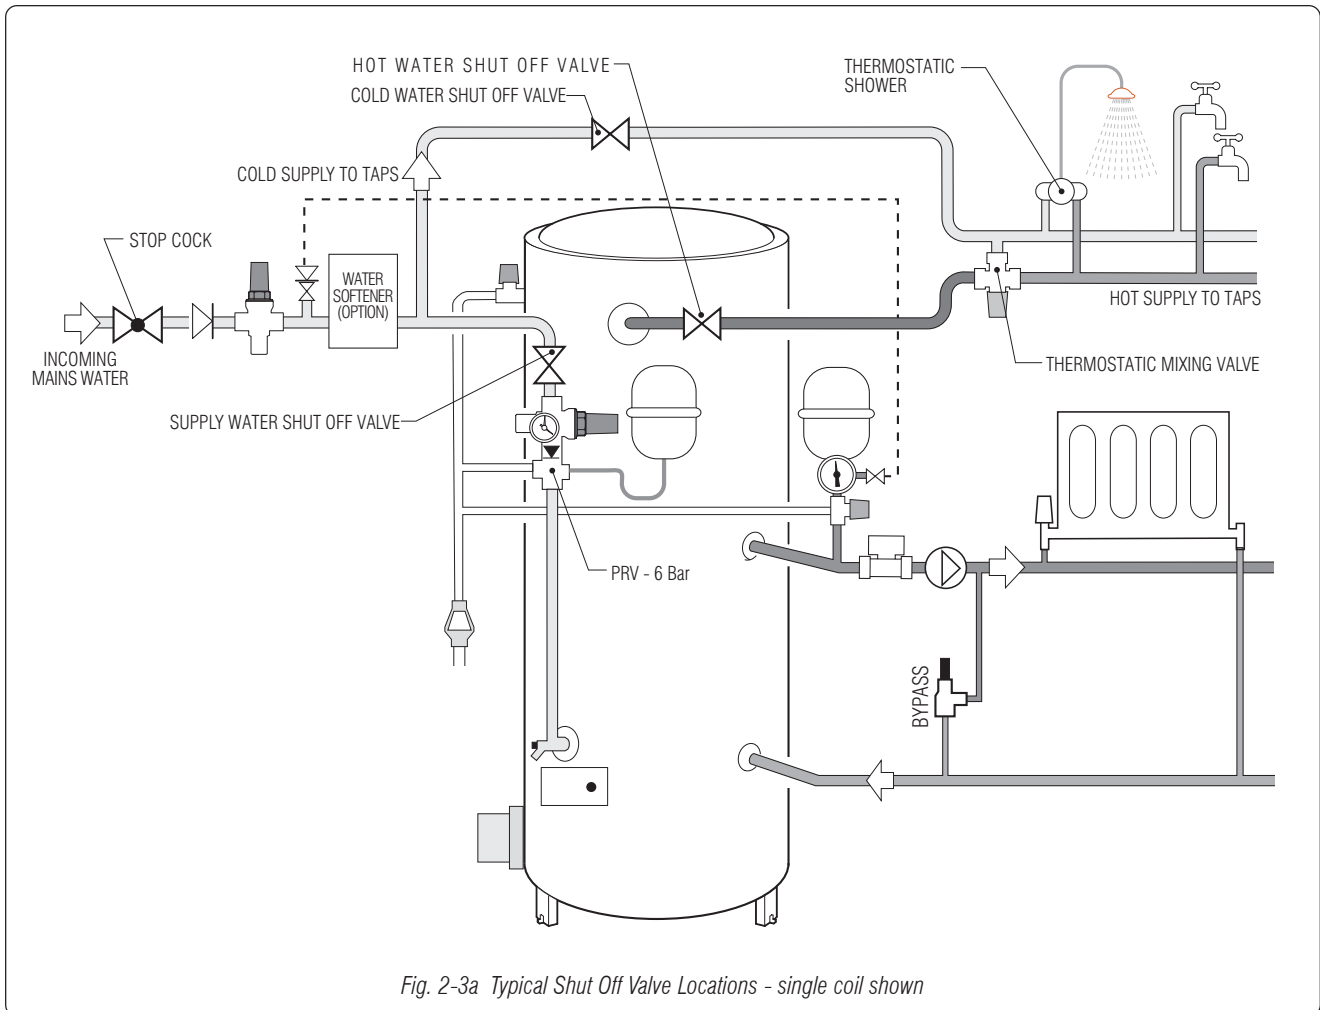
Typical Shut Off Valve Locations - single coil shown
